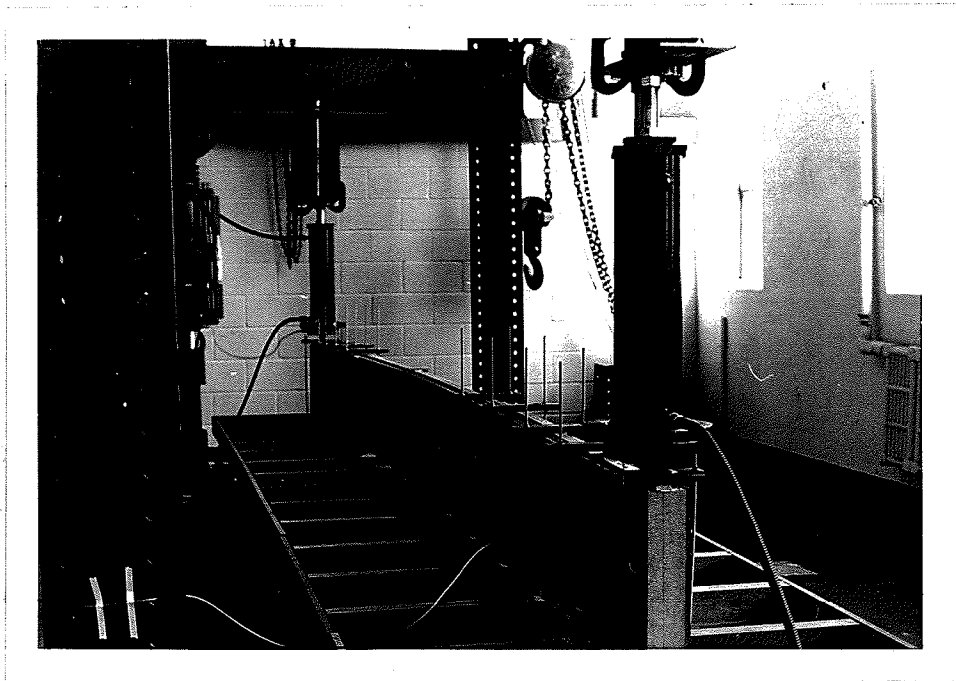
Test Structure with Extra Steel Rods and Nuts
